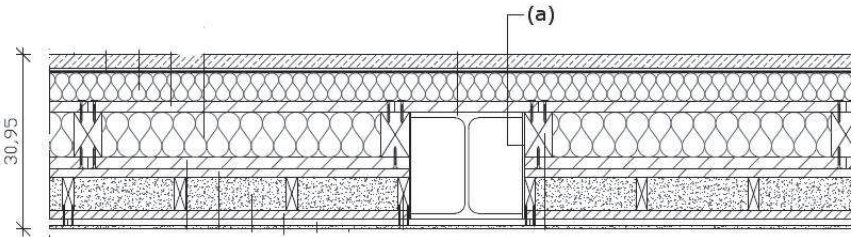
Particular of the coupling between vertical wall and steel pillar.
